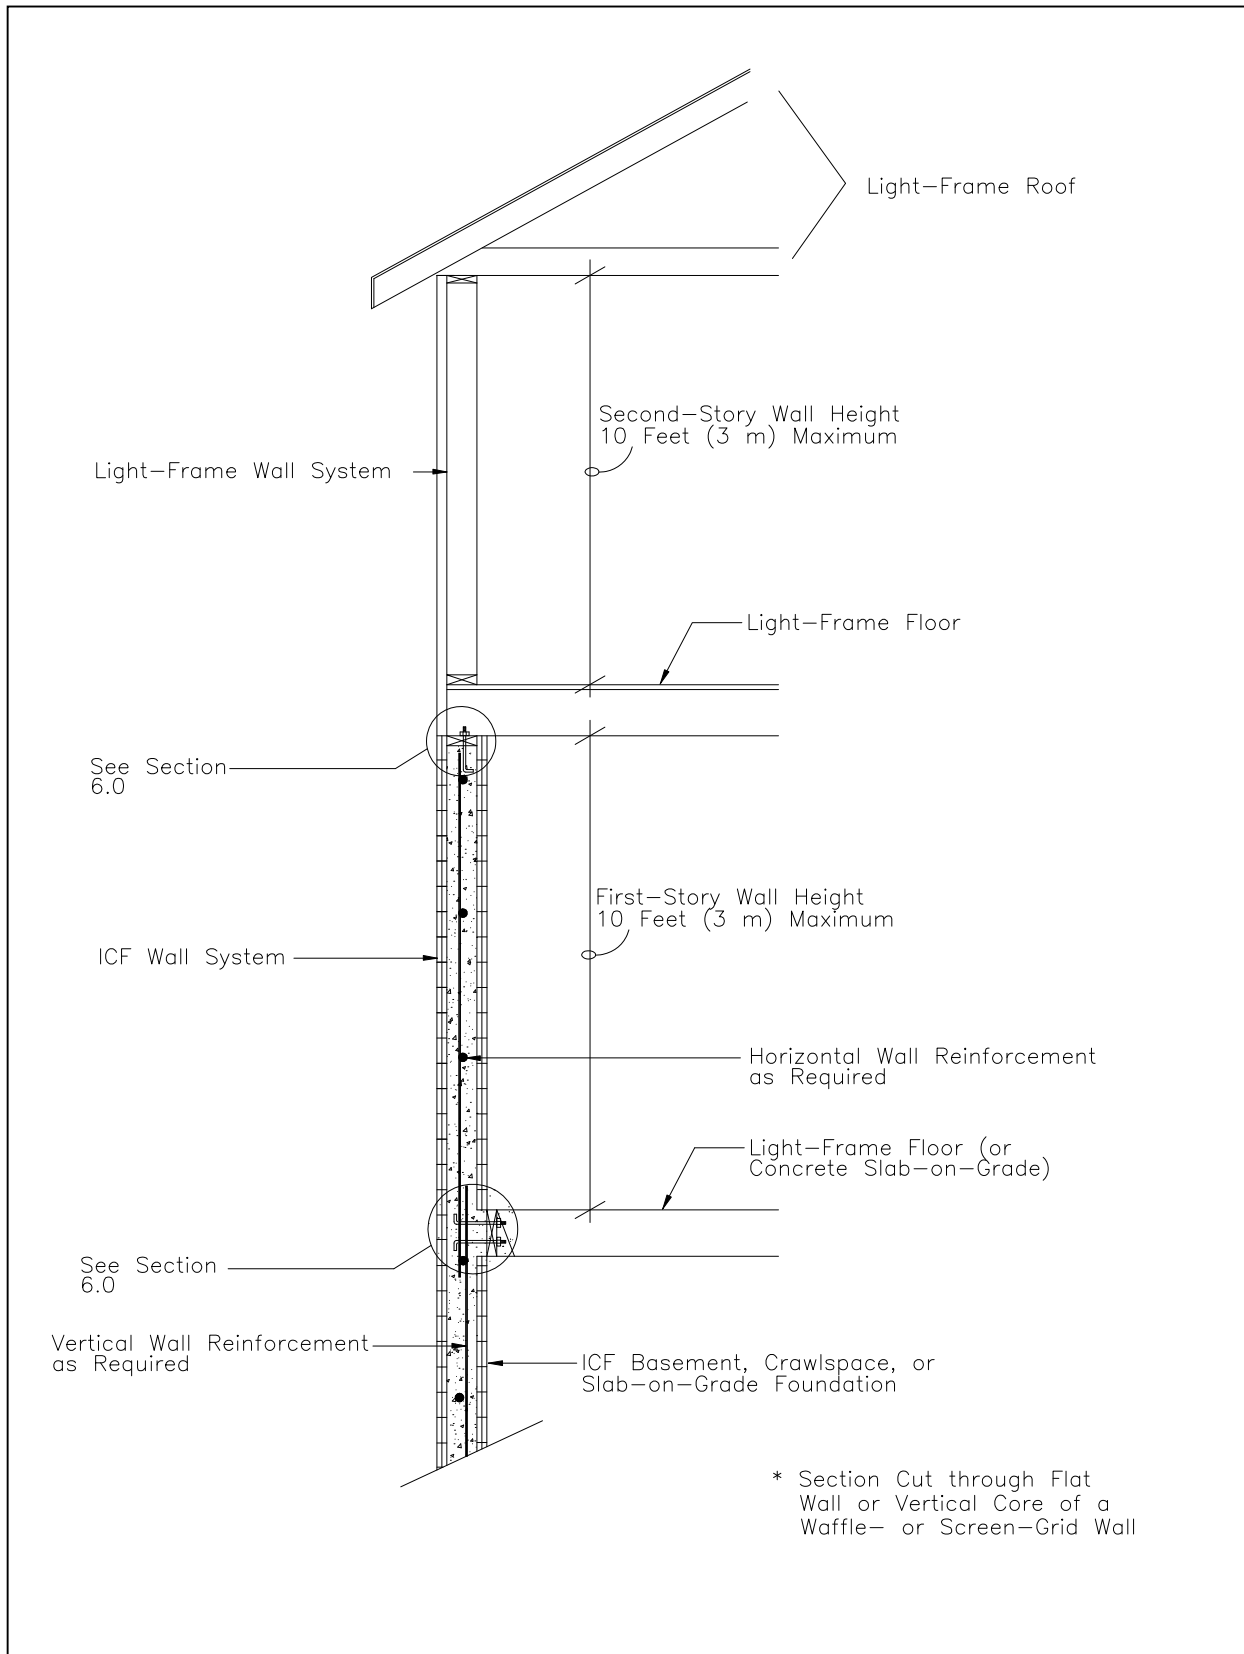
ICF Wall Supporting Light-Frame Roof
